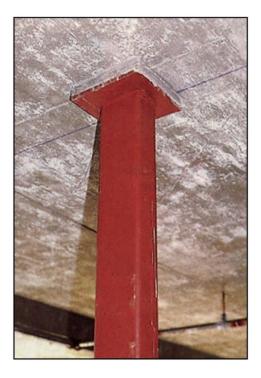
Typical arrangement of base plate for the steel tube section (Repair &
